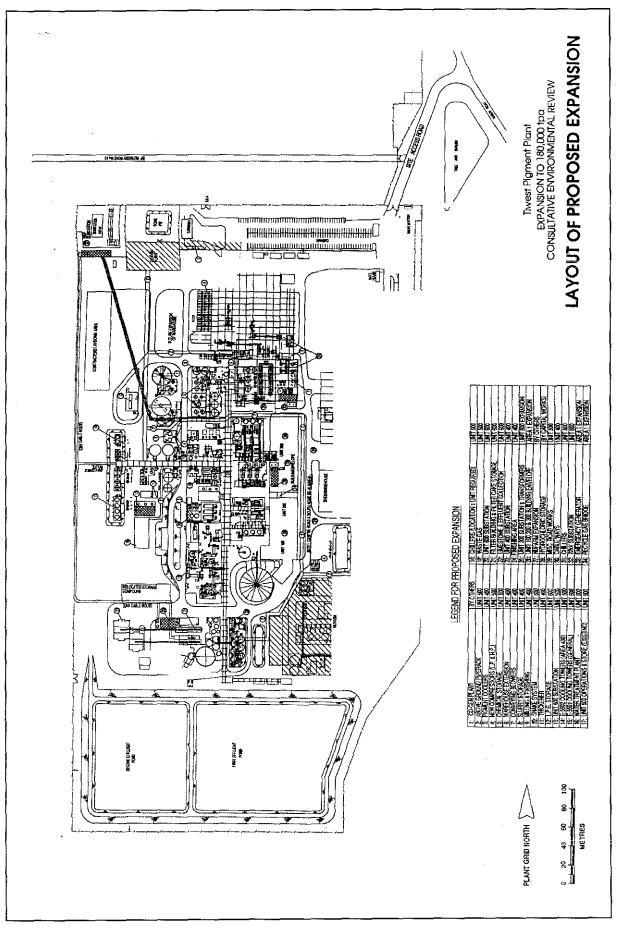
Layout of proposed expansion (Source: CER, 1996).
